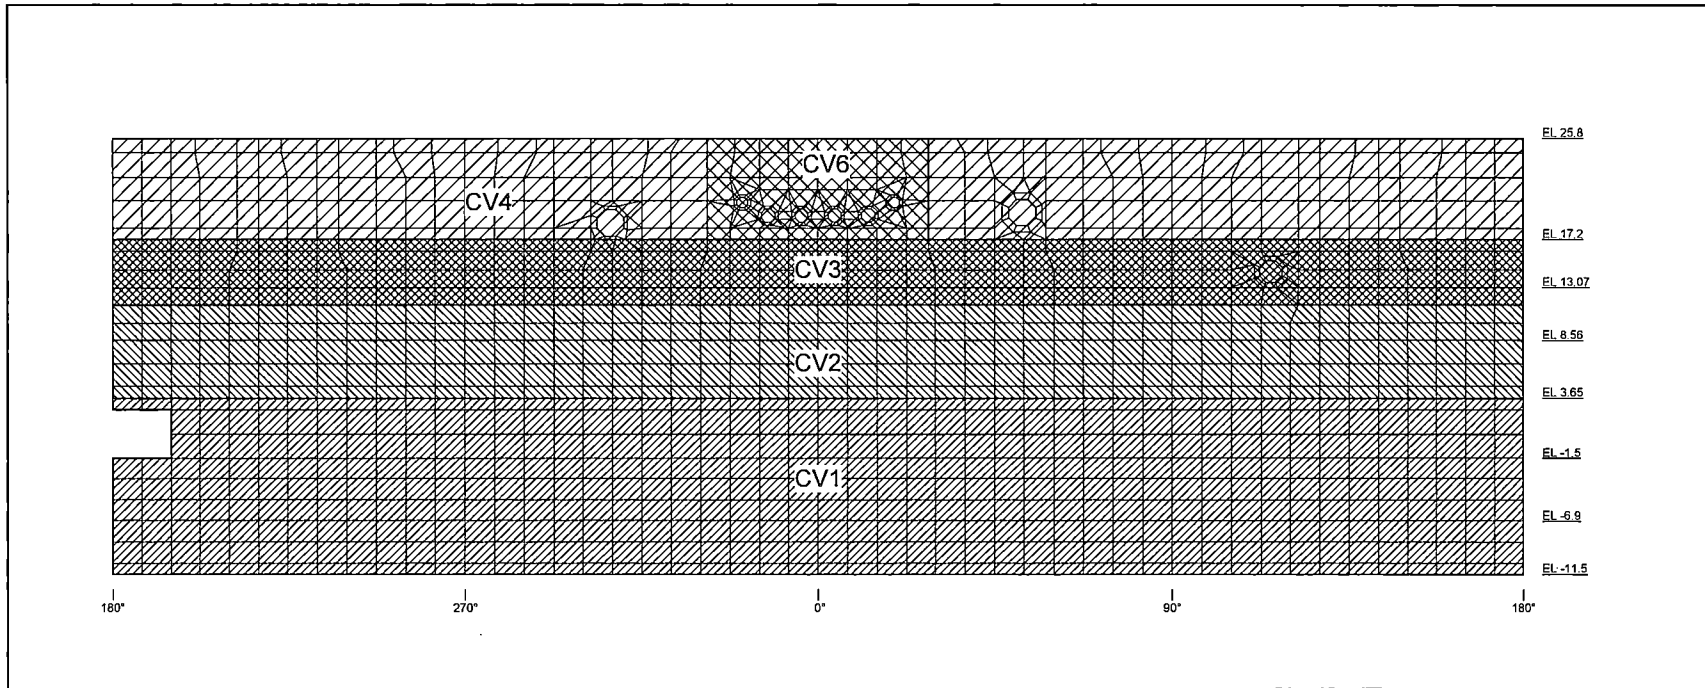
Application of Thermal Load on the RCCV Wall (LOCA Flooding Condition 3)
